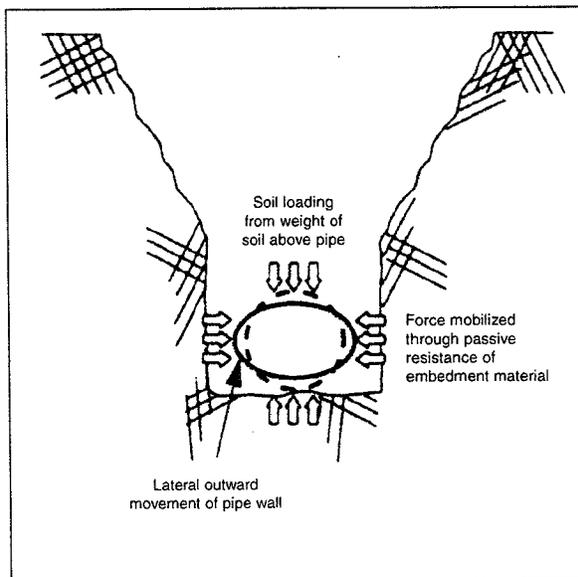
Mobilization of Enveloping Soil through Pipe Deformation
